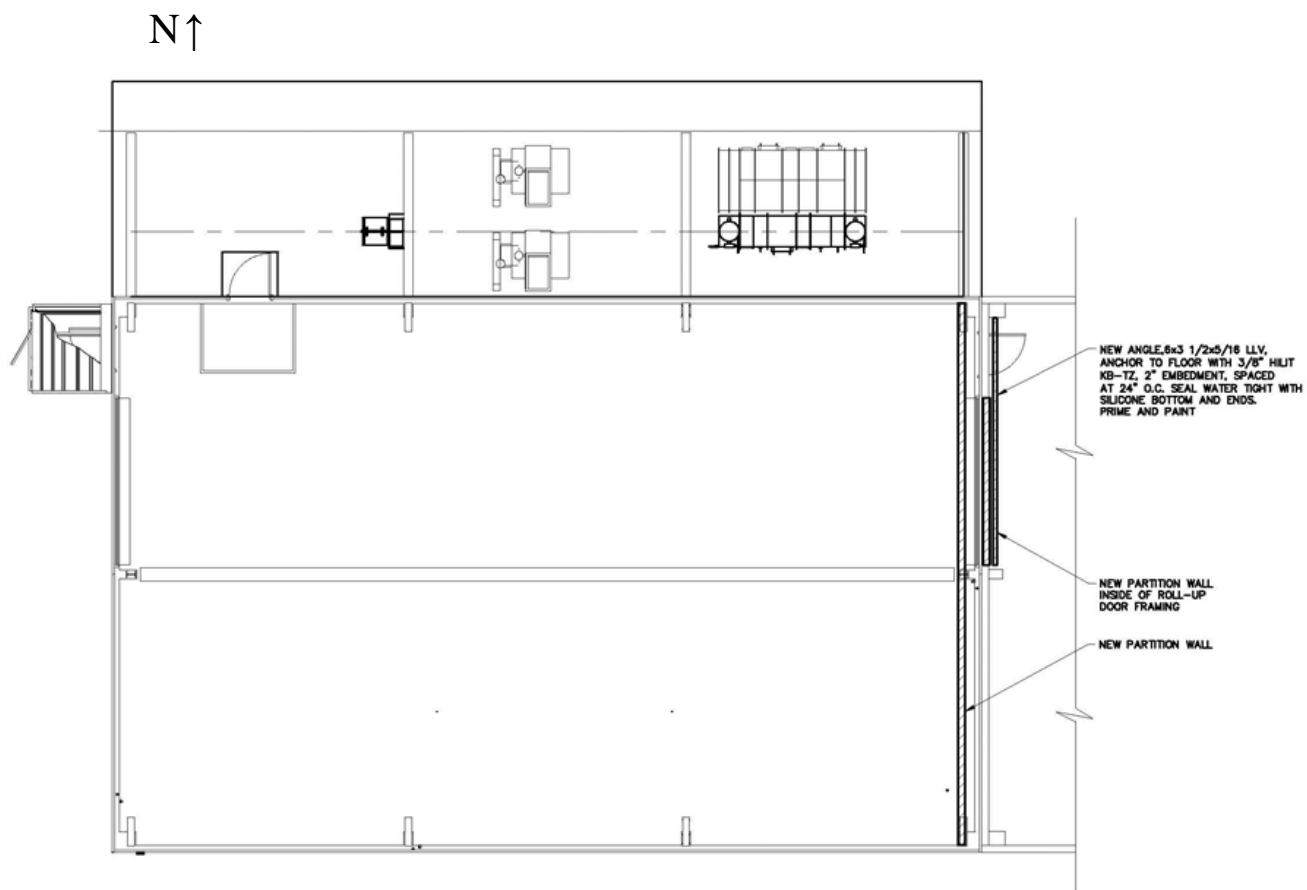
Layout of MFC-794 west side room showing newly constructed wall.
